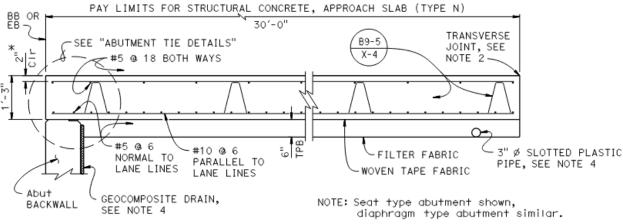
NDOT Typical Approach Slab Design and Detailing
